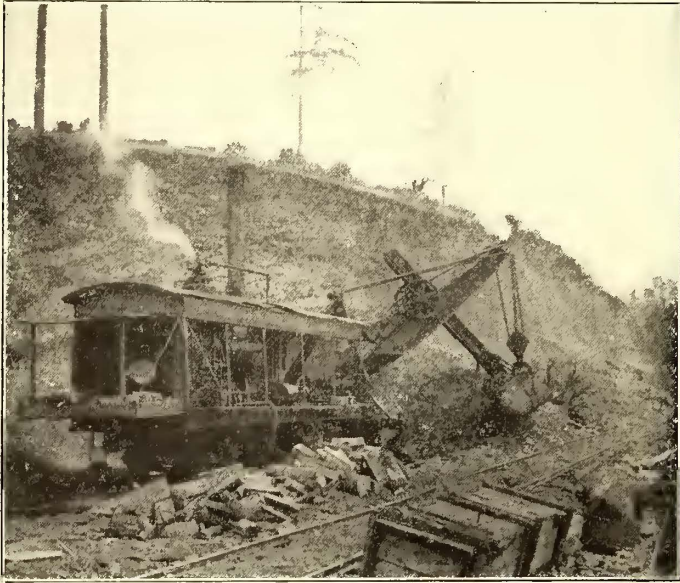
STEAM SHOVEL WORKING IN GRAVEL PIT DURING THE CONSTRUCTION OF THE RAILWAY
